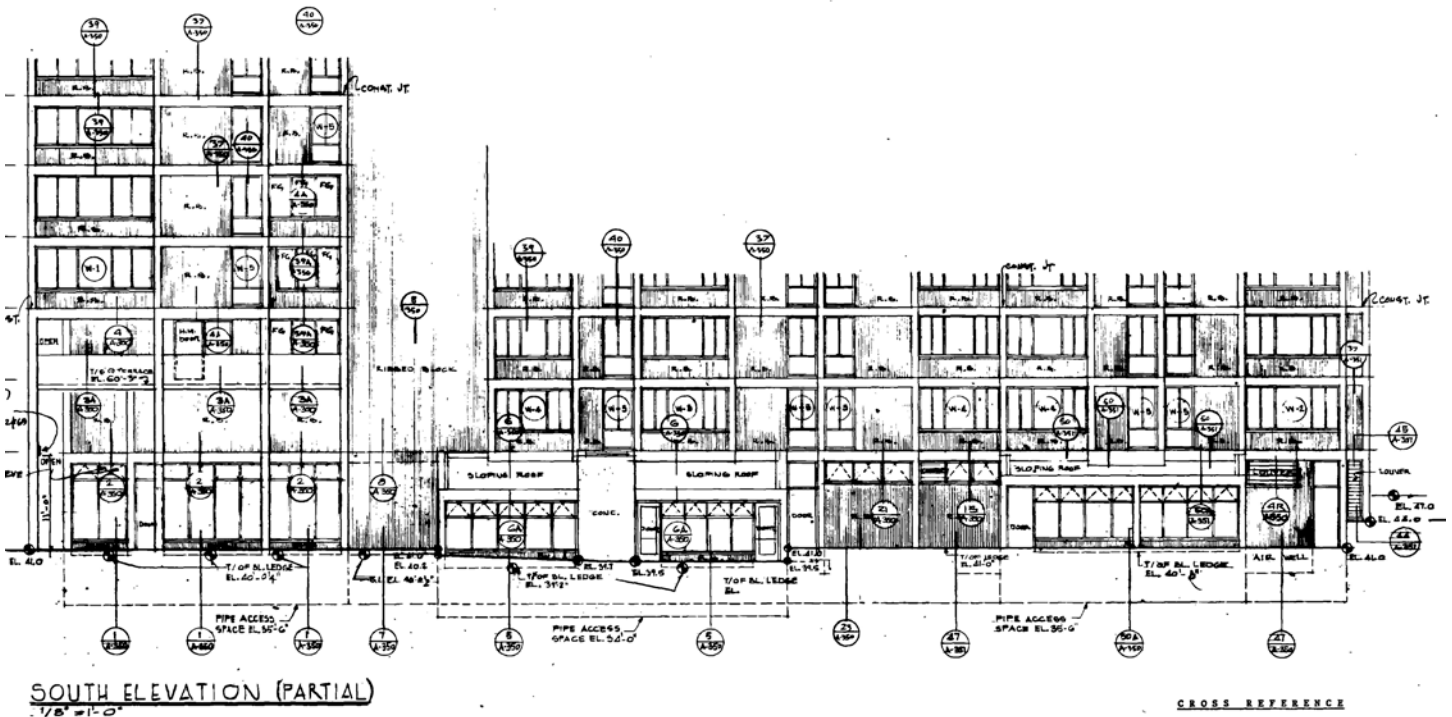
Drawing of the lower levels of the south elevation, 1969. Here, the façade is articulated with an exposed concrete frame, split-ribbed-concrete block infill and large expanses of windows. (NYCHA)
